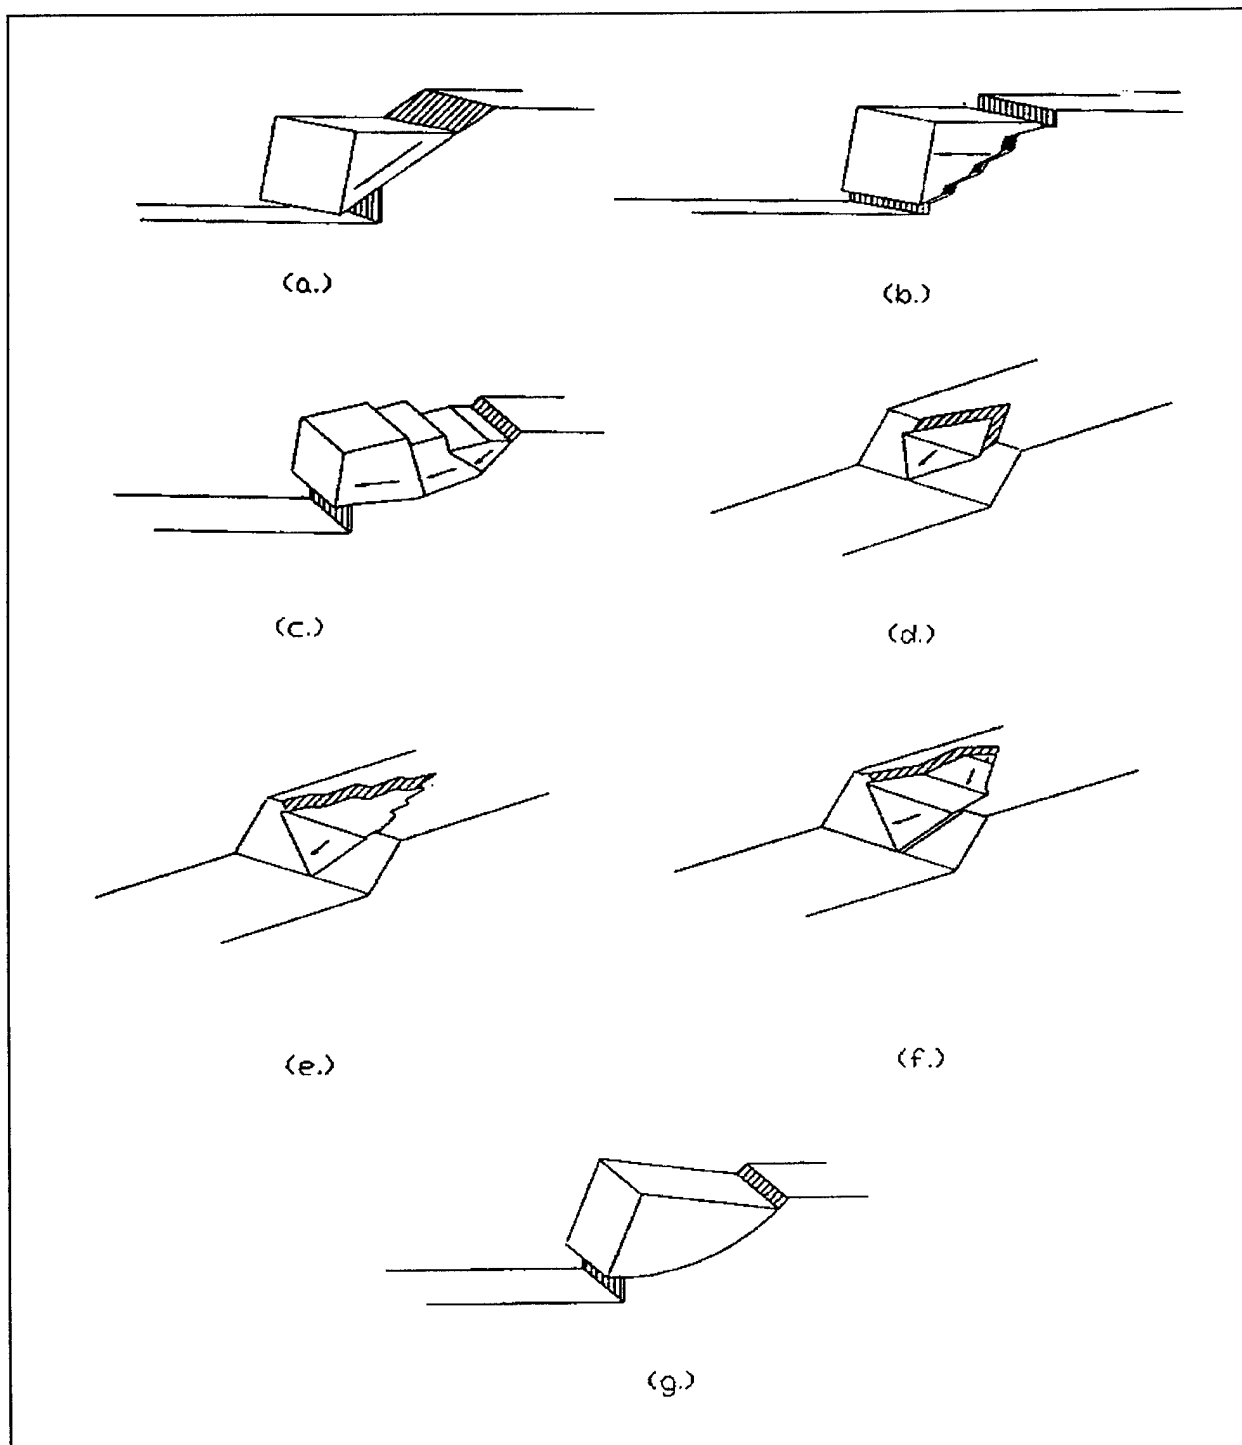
Failure mechanisms for the sliding failure mode: a) single block with single plane; b) single block with stepped planes; c) multiple blocks with multiple planes; d) single wedge with two intersecting planes; e) single wedge with multiple intersecting planes; f) multiple wedges with multiple intersecting planes; and g) single block with circular slip path
